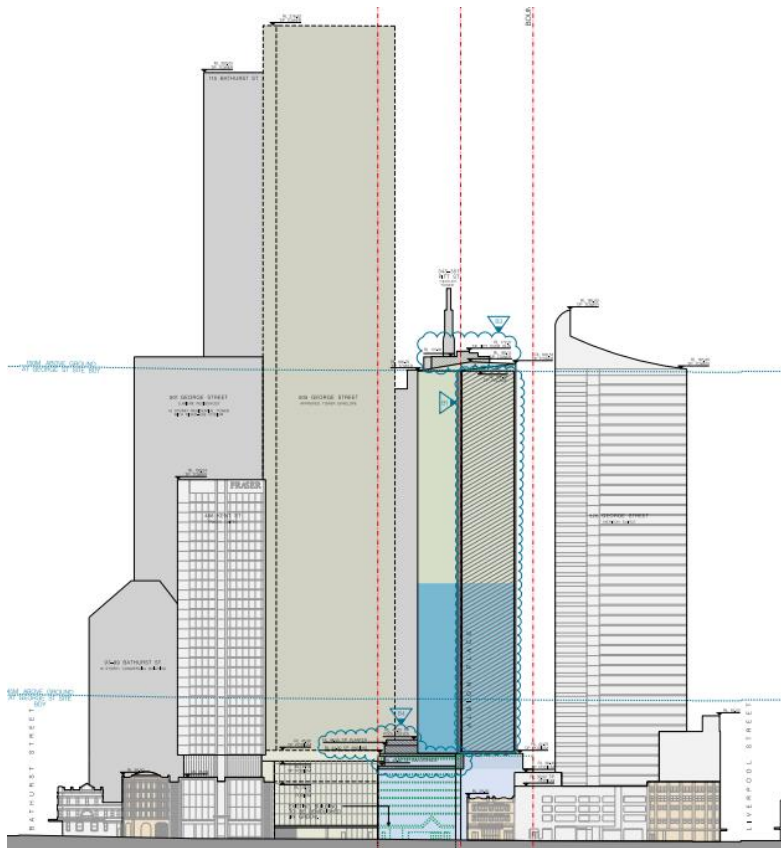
Proposed Kent Street (west) elevation, areas to be modified clouded
